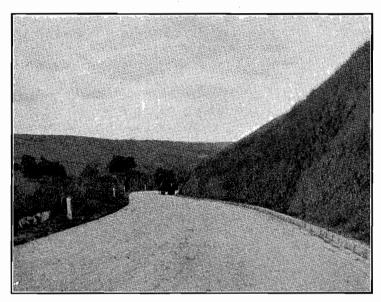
Fyansford Road, surfaced with penetration cement concrete.
